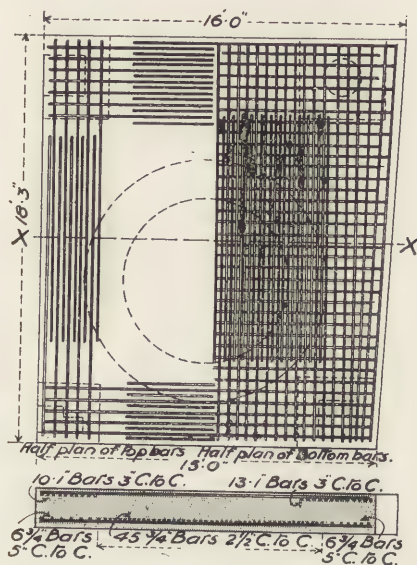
Plan and Section of Footing for Chimney and Four Columns.
